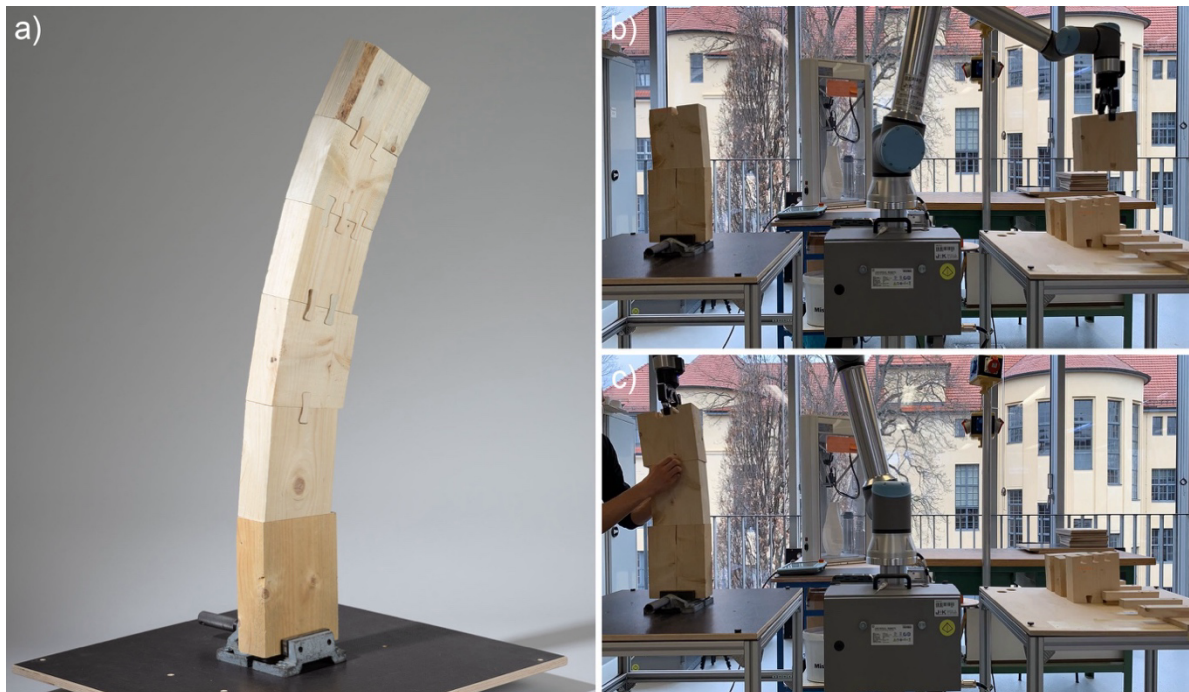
a) the Assembled Research Prototype. b) & c) Collaborative Human-Robot Assembly of the Research Prototype. 2022.
